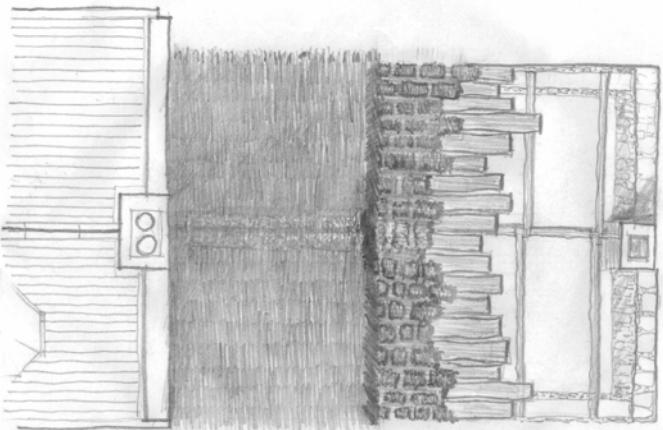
Roof plan sketch. This sketch, with the various construction elements peeled back to reveal the building sequence, shows (left to right): the slate roof of the later one-and-a-half-storey house; straw and clay thatch finish; turf divots; sarking boards; trusses; stone gable with brick chimney.
